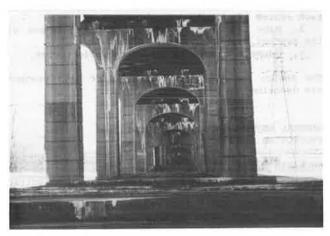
Salt straining on pier bents, Burlington Bay Skyway.
